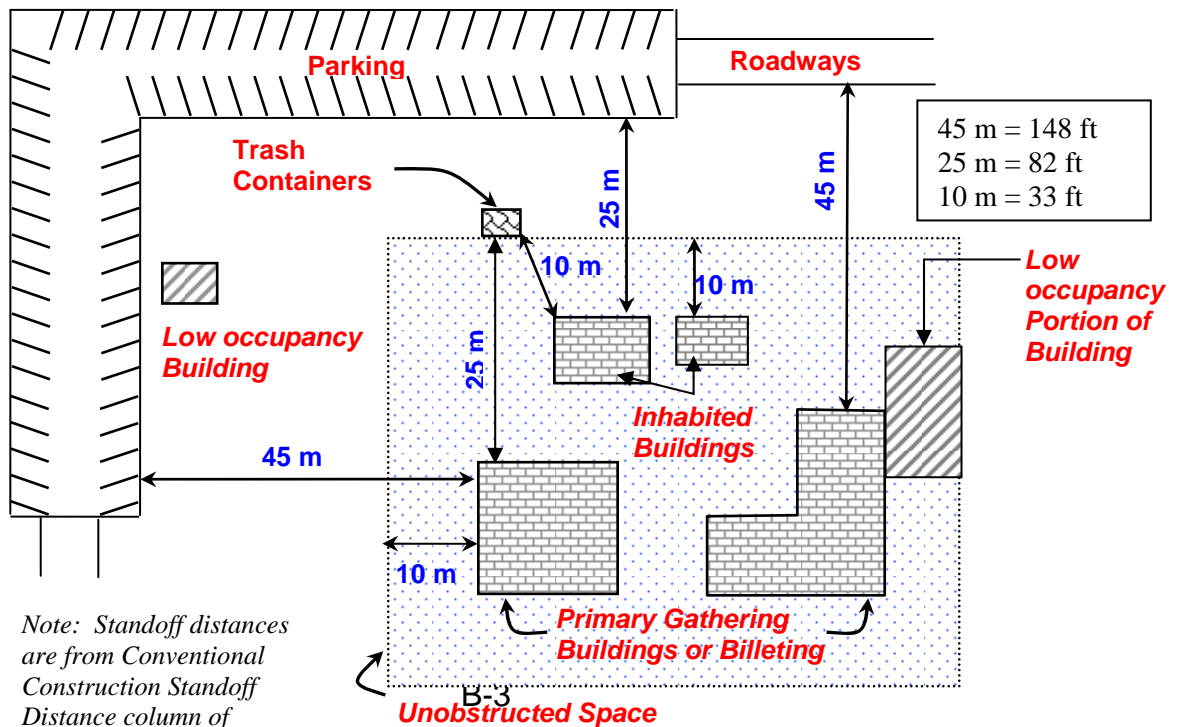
Parking and Roadway Control for Existing Buildings – Controlled Perimeter
